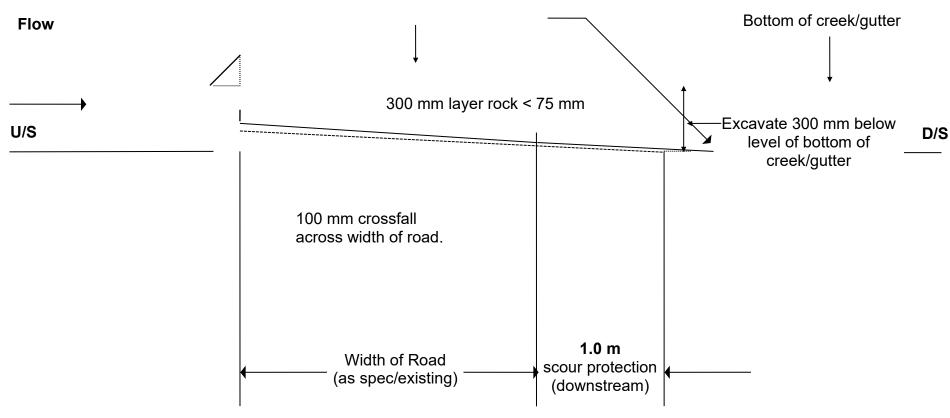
8-1 FLOODWAY DESIGN – ELEVATION VIEW (not to scale)
